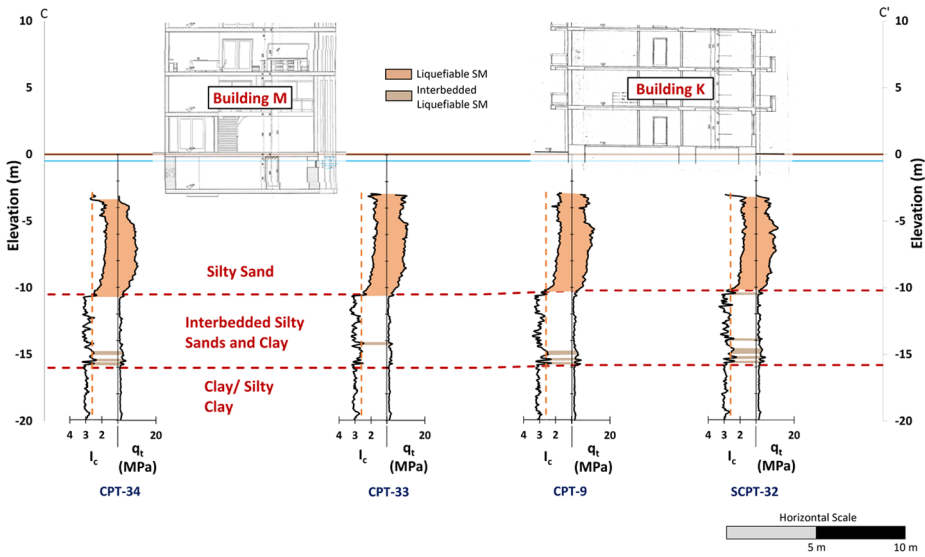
Cross-section C-C' from Figure 12 of Area 2 (only first 3 stories of building plans shown for Buildings M and K; Building L (not shown) is between Buildings M and K).
